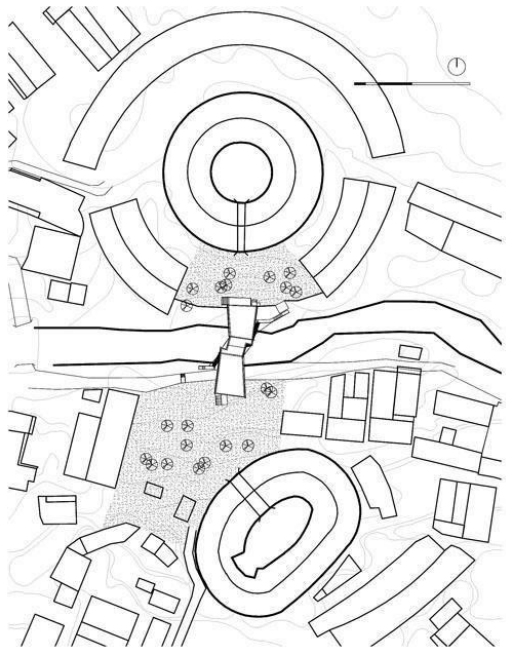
Plan of the Bridge School showing how the 'bridge' connects two parts of the village.
